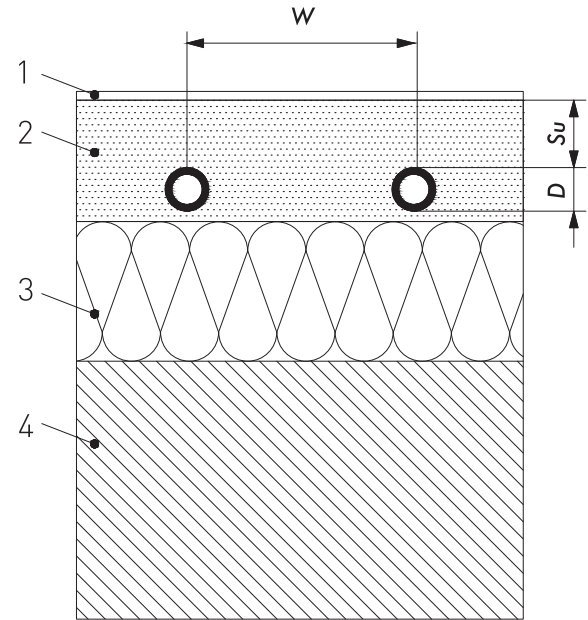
Radiant floor structure: 1) floor finishing, 2) mortar, 3) thermal insulation, 4) concrete slab [25].
